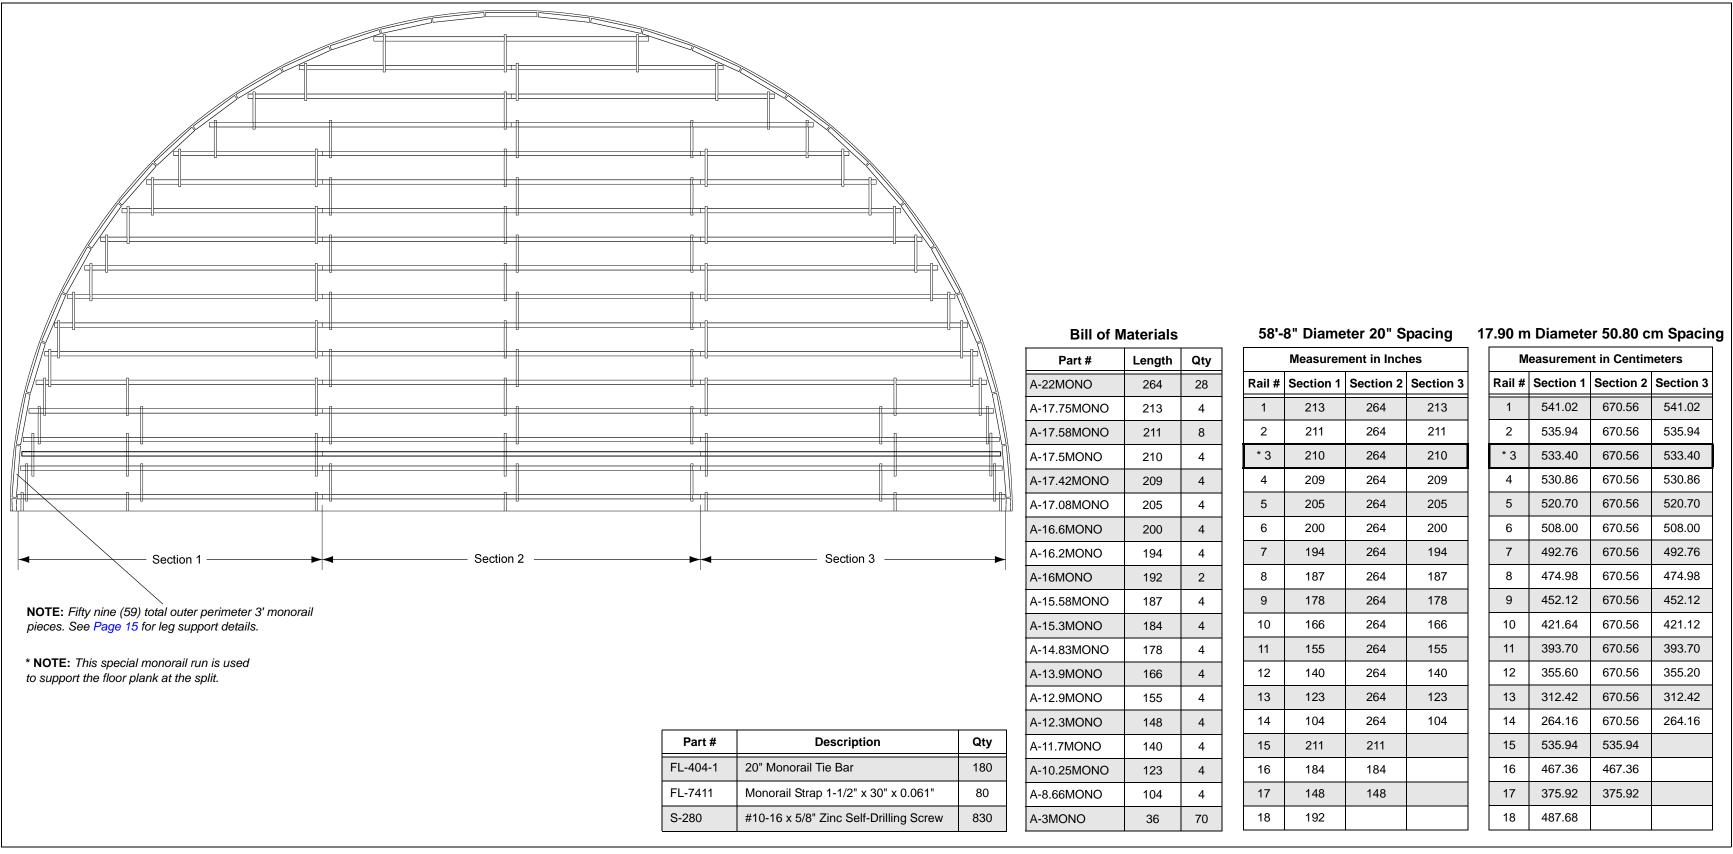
C 60'-20" Monorail Spacing Layout for Recessed Full Floor
